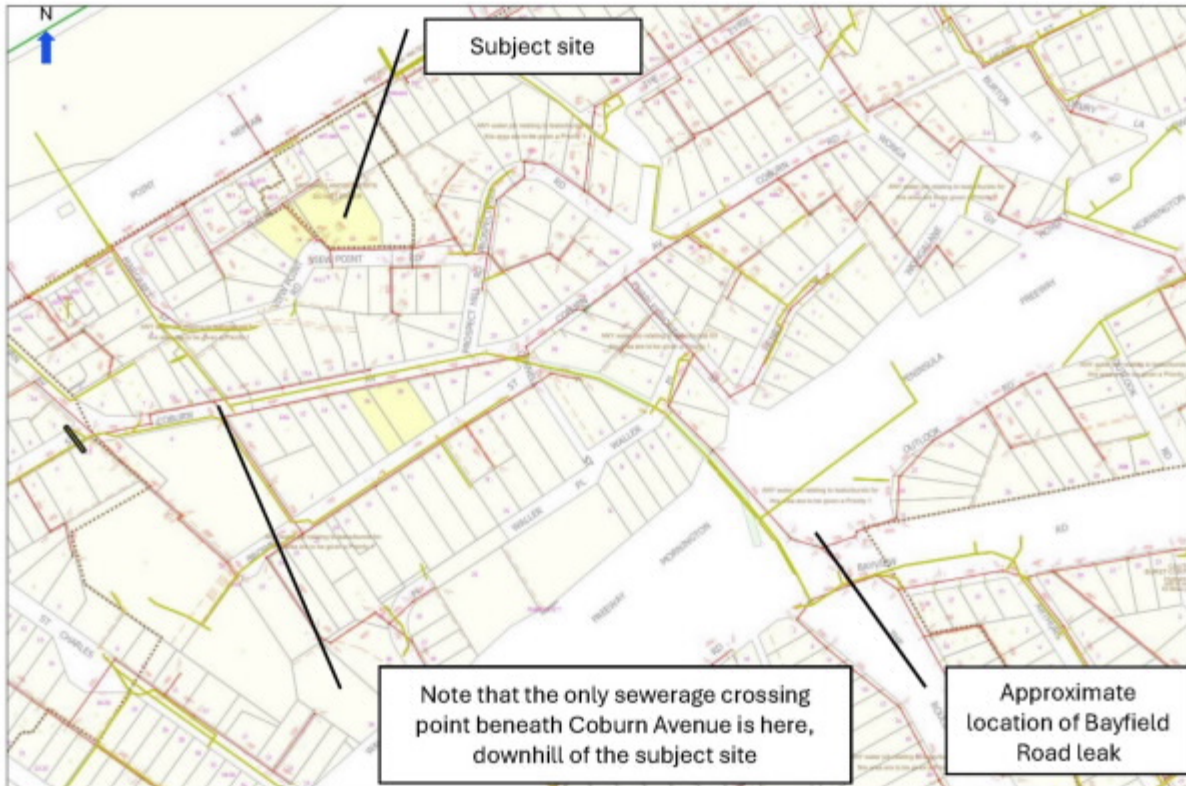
Plan showing sewerage network around locality of View Point Road. Note that the leak near Bayview Road is the south side of Mornington Freeway.
